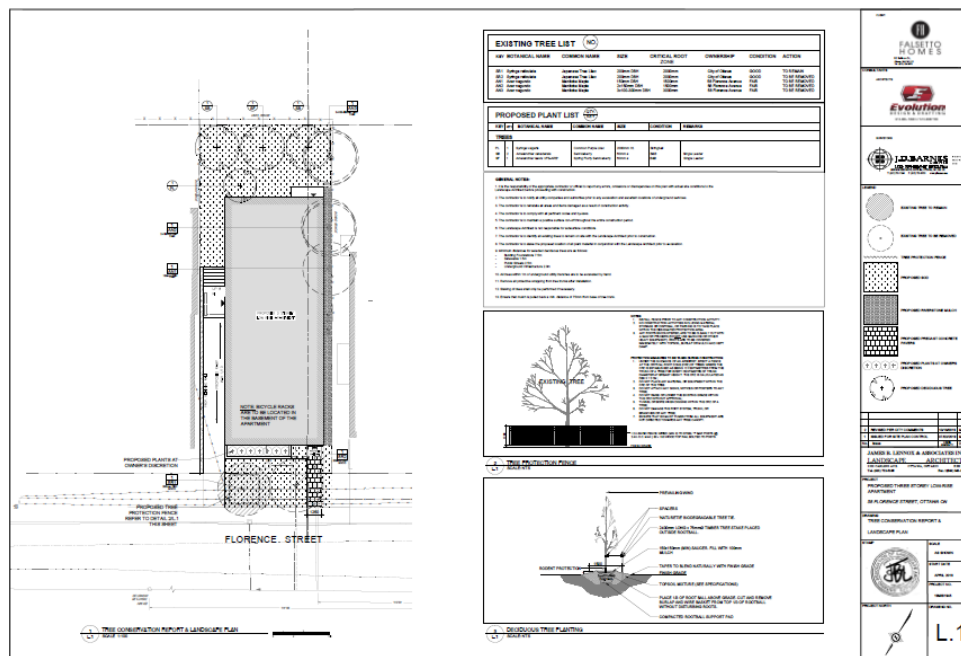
Landscape plan with planting details showing the proposed treatment of the grounds. Source: J. D. Barnes. May 2019.
